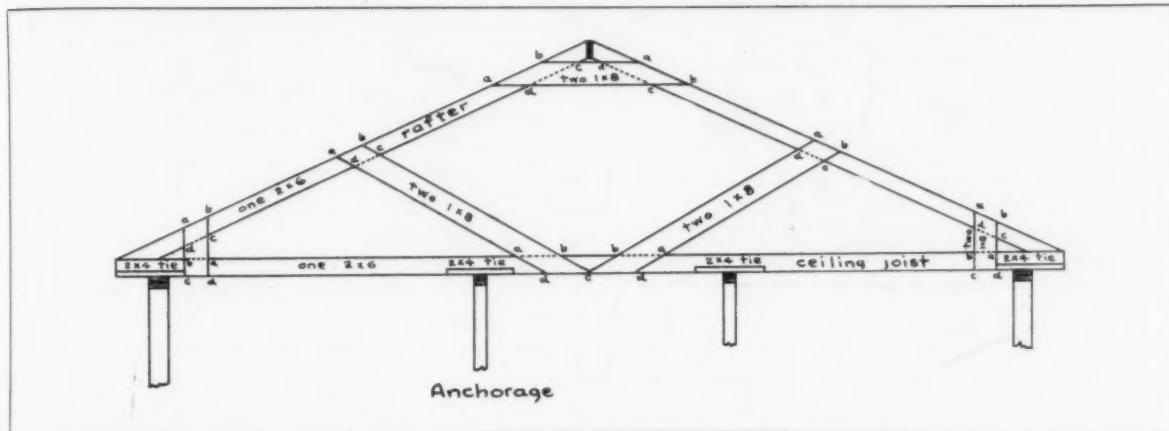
Anchorage of Roof Framing Against Hurricanes
